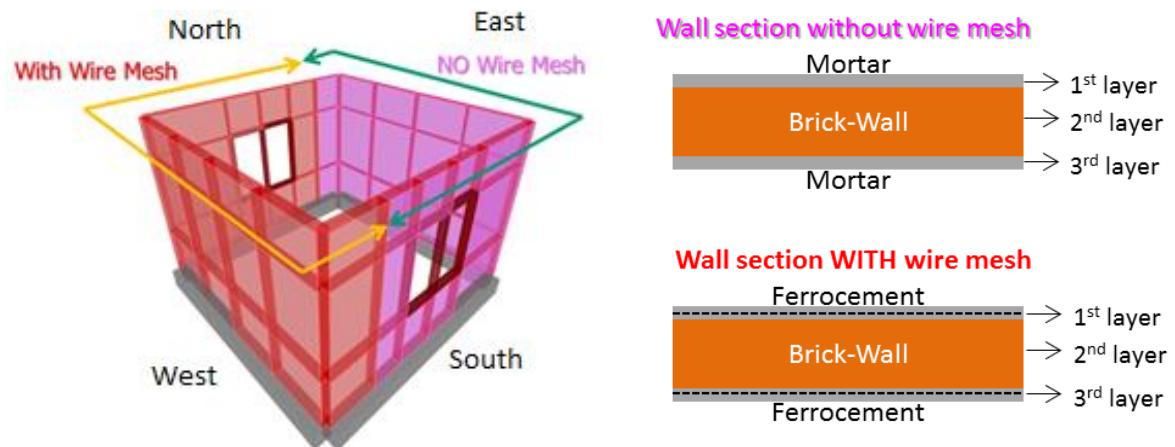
(a) 3D Model of Masonry Building Strengthened using Wire Mesh
